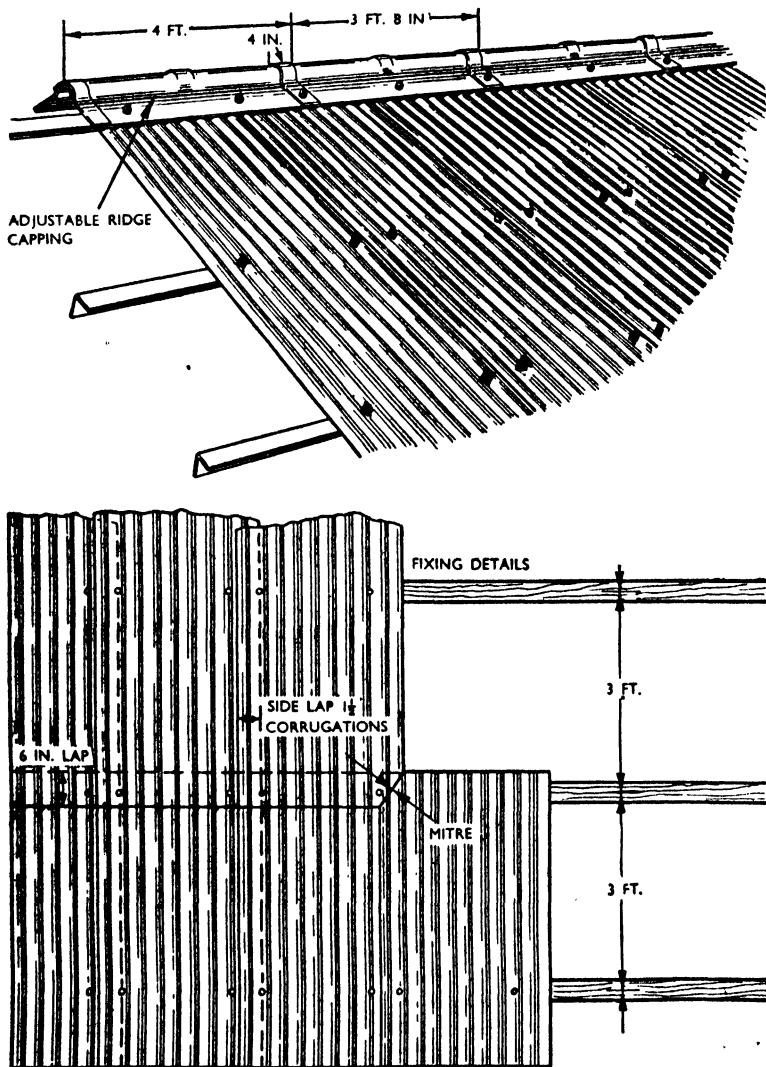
Asbestos-cement corrugated sheeting. Details of minimum end and side lap for standard-type sheets and positions of fixings. (Top) Apex finished with an adjustable ridge capping piece. Alternatively, close fitting or ventilating ridge pieces may be used. The sheets are obtainable in sizes to suit most purposes.
